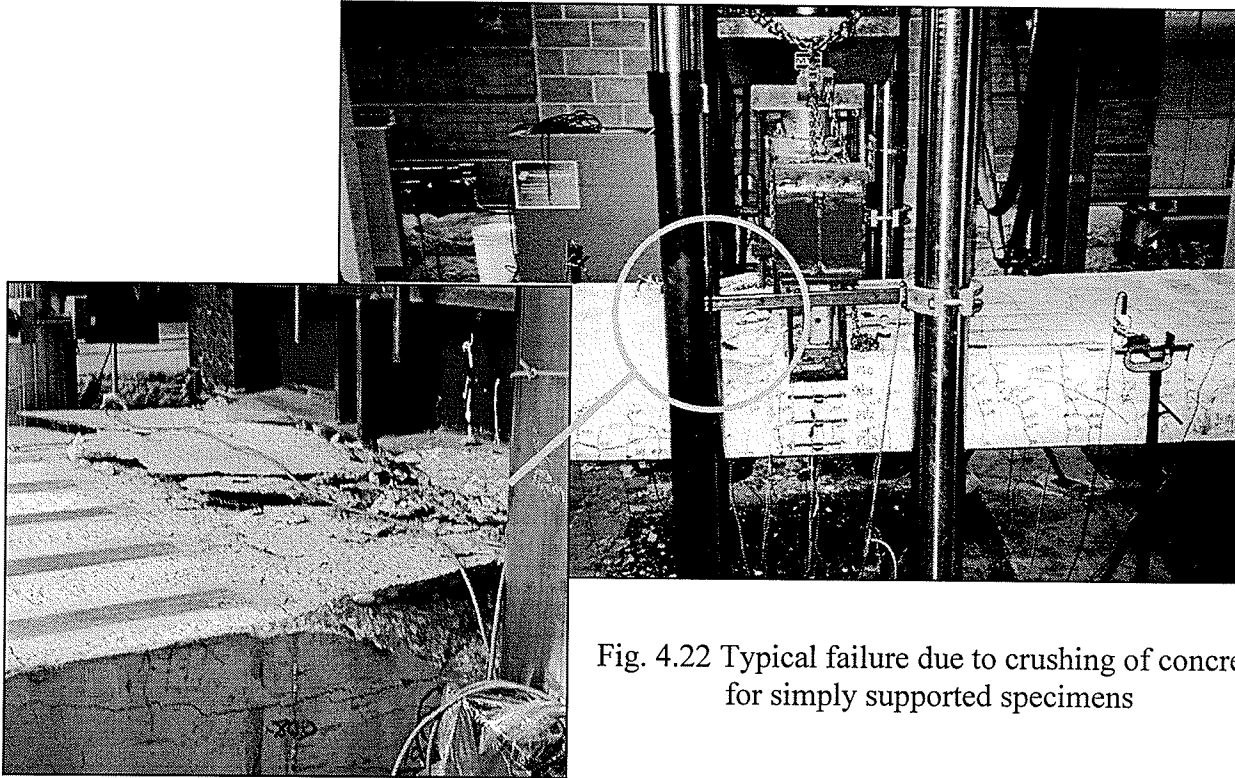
Typical failure due to crushing of concrete for simply supported specimens
